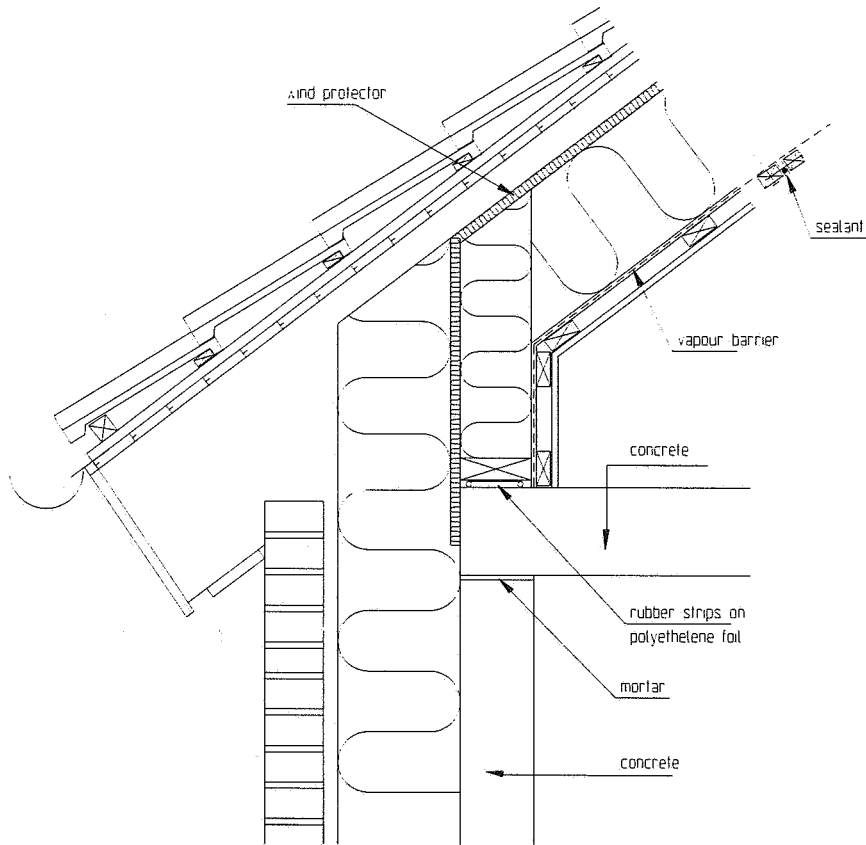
The figure shows a connection between an external wall, an intermediate floor and a roof. Mortar is placed in-between the external wall and the intermediate floor to achieve airtightness. Polyethelene foil with rubber strips are placed under the extra wooden sill between the roof trusses in order to achieve airtightness. The overlap joint of the polyethylene foil in the ceiling is clamped between two battens and to the sill.
